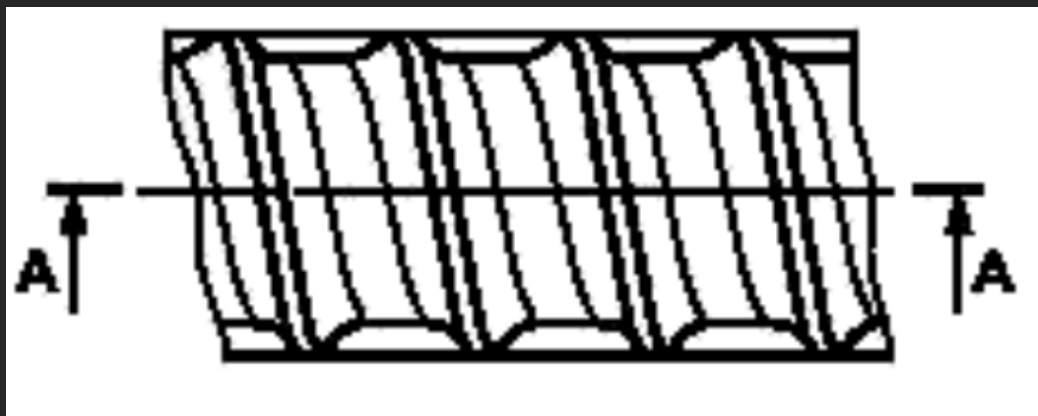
Example of shape and measurement position of thread knot reinforcing steel bar
